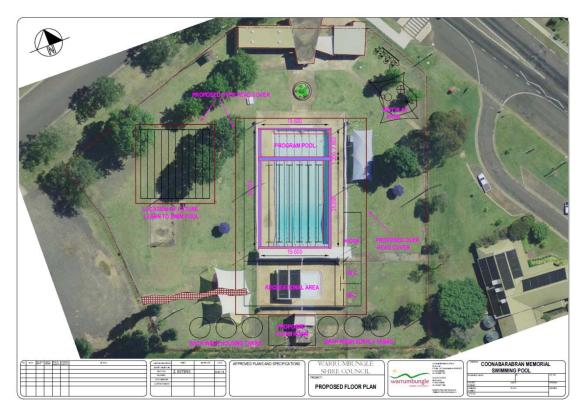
Proposed Coonabarabran Pool Facility Site Plan
